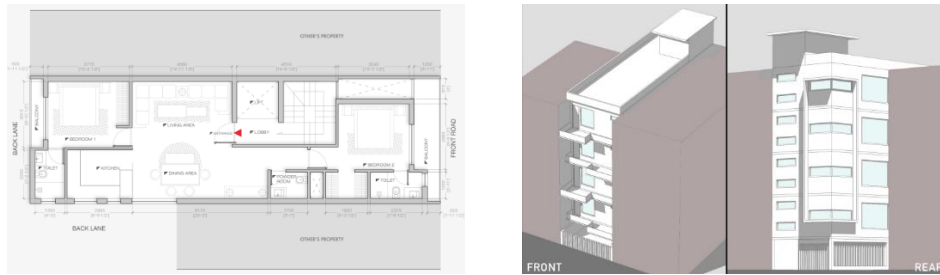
First Floor Plan and 3D view of Residential Building *Source – Authors
